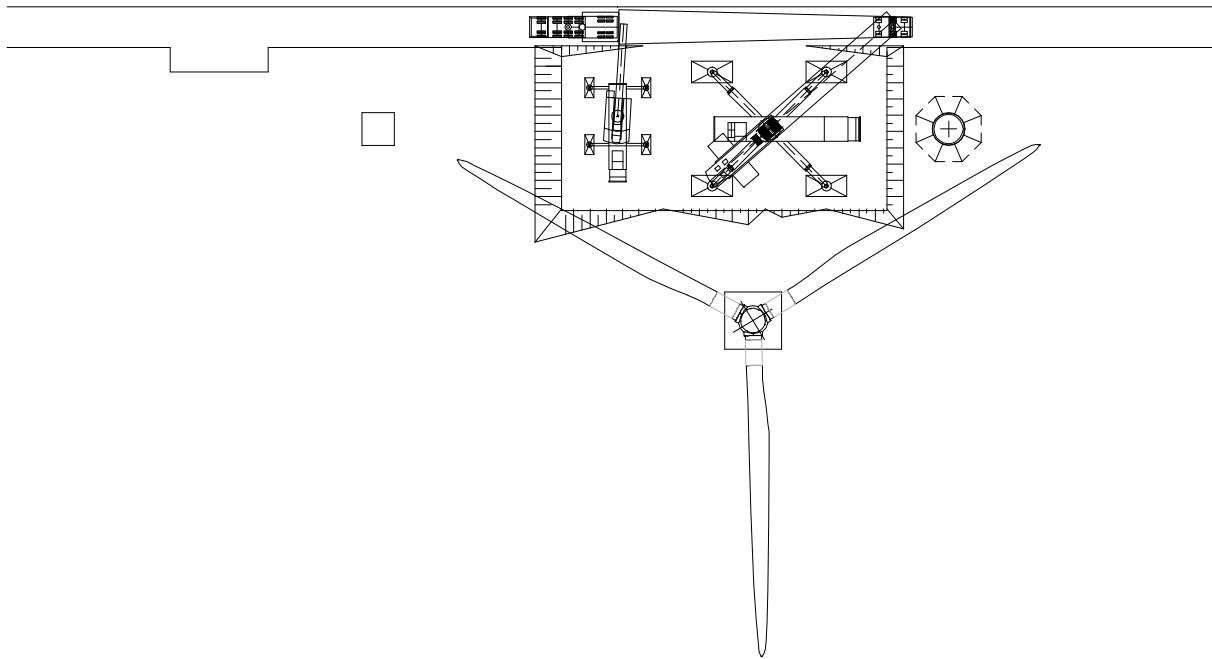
Mounting the turbine – tower. NB! Delivery of turbine parts from right, driving left.
